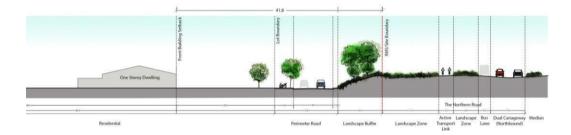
Section of The Northern Road Landscaping and Dwelling Setback
